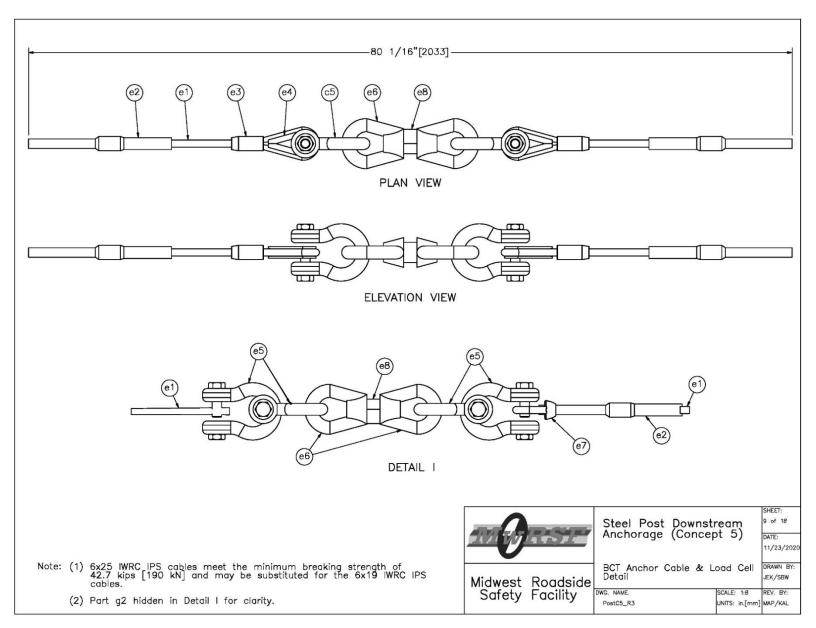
BCT Anchor Cable and Load Cell Detail, Test No. SPDA-5
